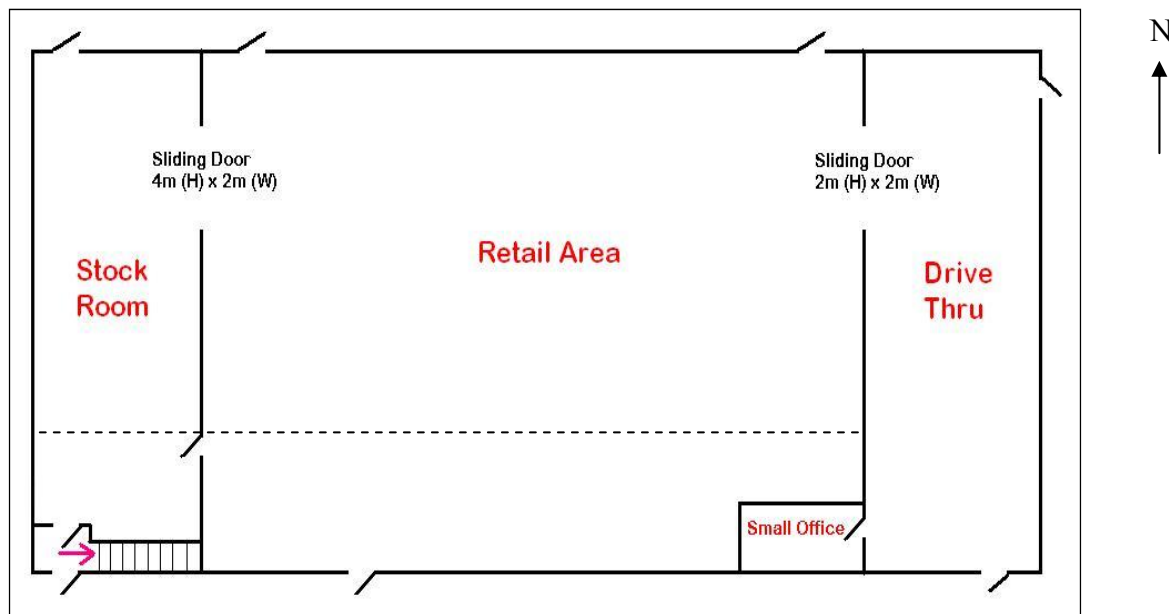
Plan view of stock room, retail area, drive thru area and small office in retail warehouse (not to scale)
